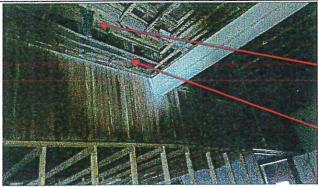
| Grid 3 Inverted King Post Truss, Looking North.
